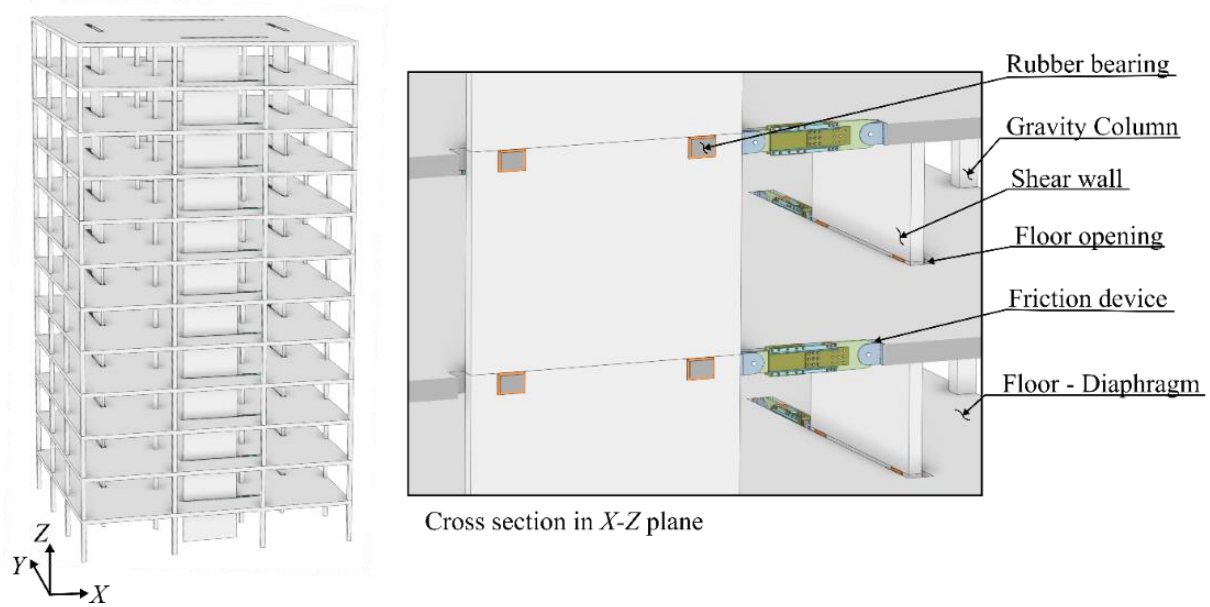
Schematic example of a building with planar walls and force-limiting connections (Adopted from: [53])
